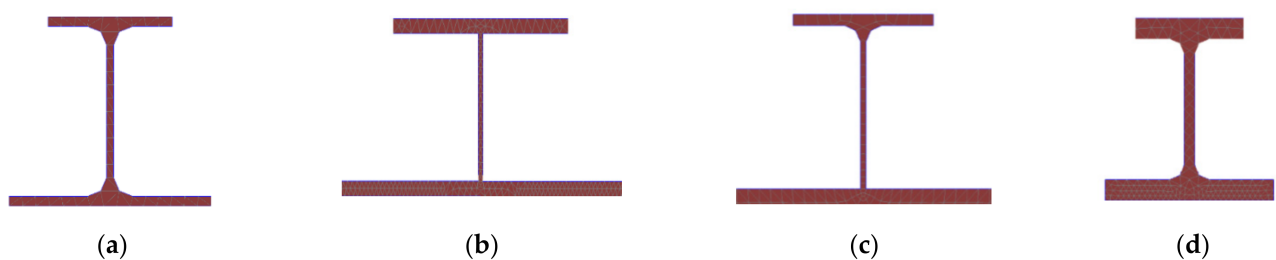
Asymmetric double-T steel cross sections as slim floor beams: (a) ASB; (b) welded; (c) IFB; (d) SB.
